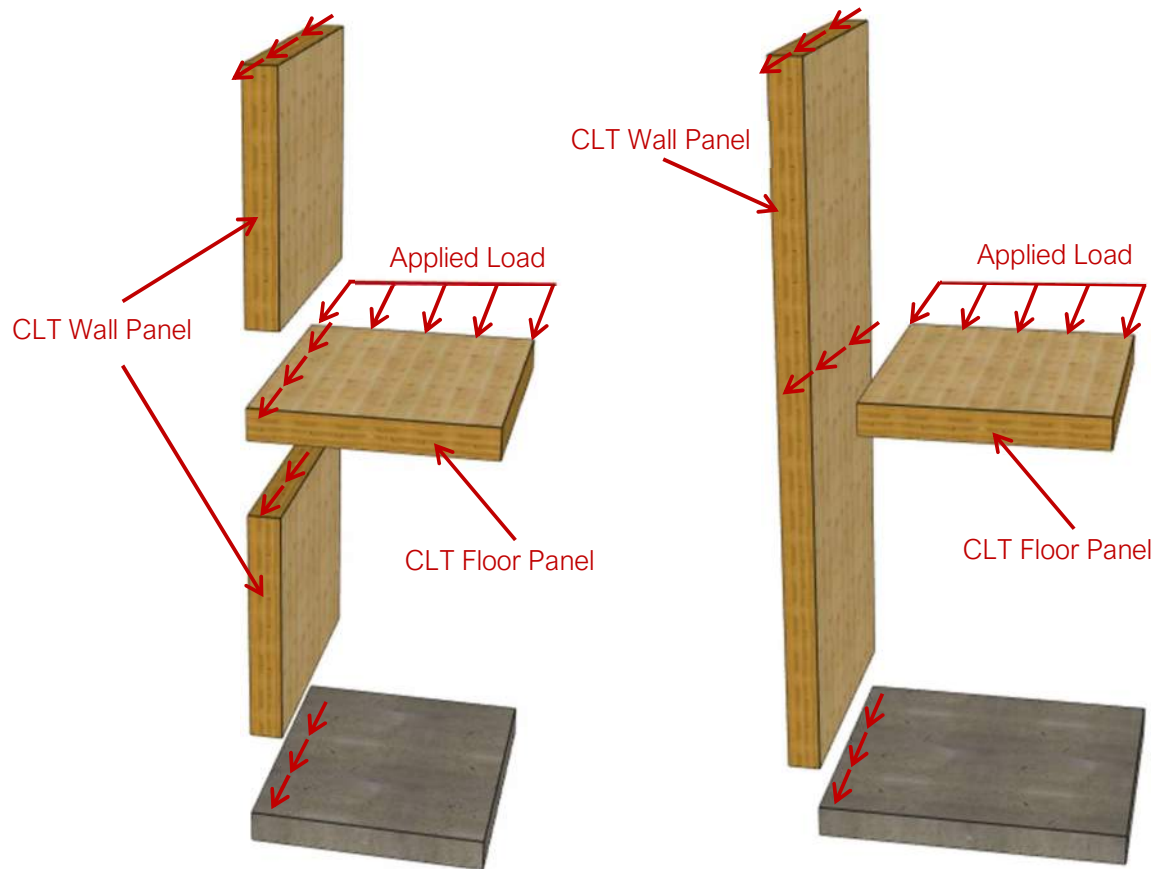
Transfer of horizontal forces between CLT floor panels and CLT walls for platform and balloon construction options.
